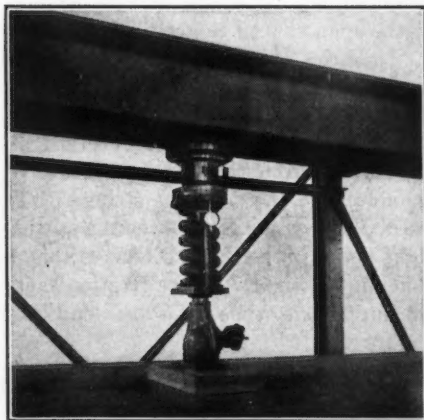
JACK USED ON FULL-SIZED FLOOR
